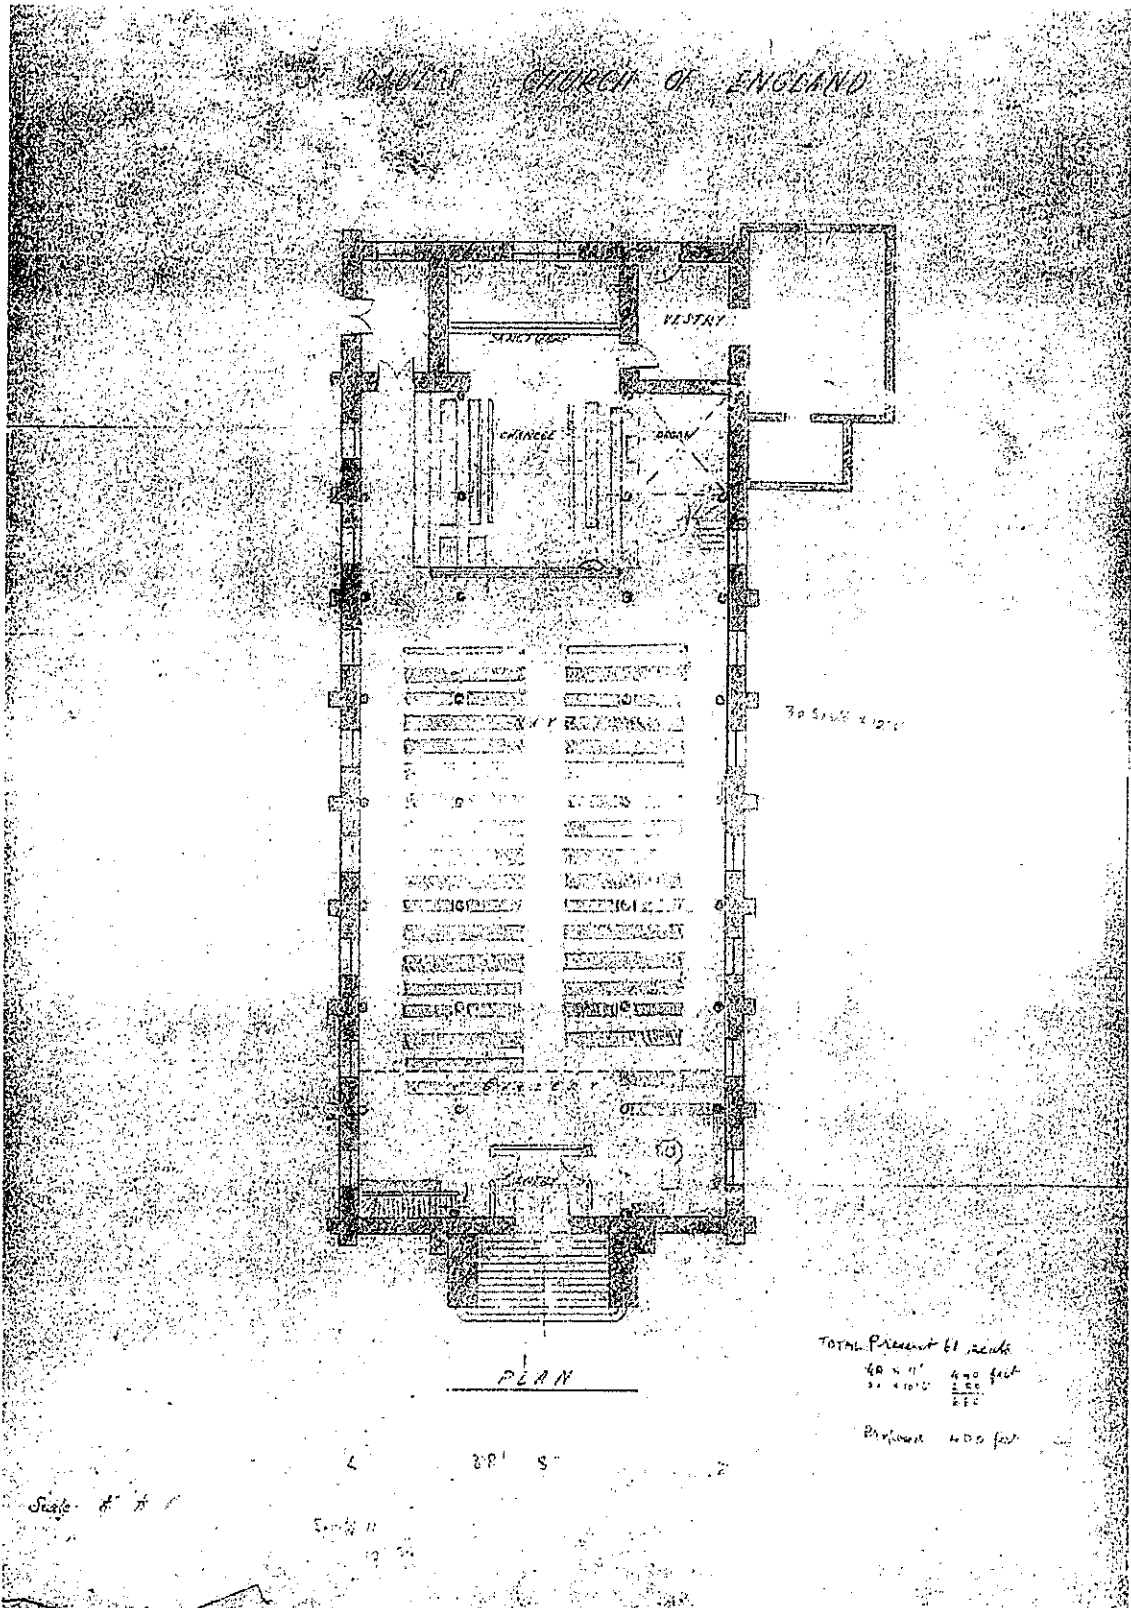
St. Paul's Church Floor Plan, (undated, pre 1952). Source: St. Paul's Anglican Church.
